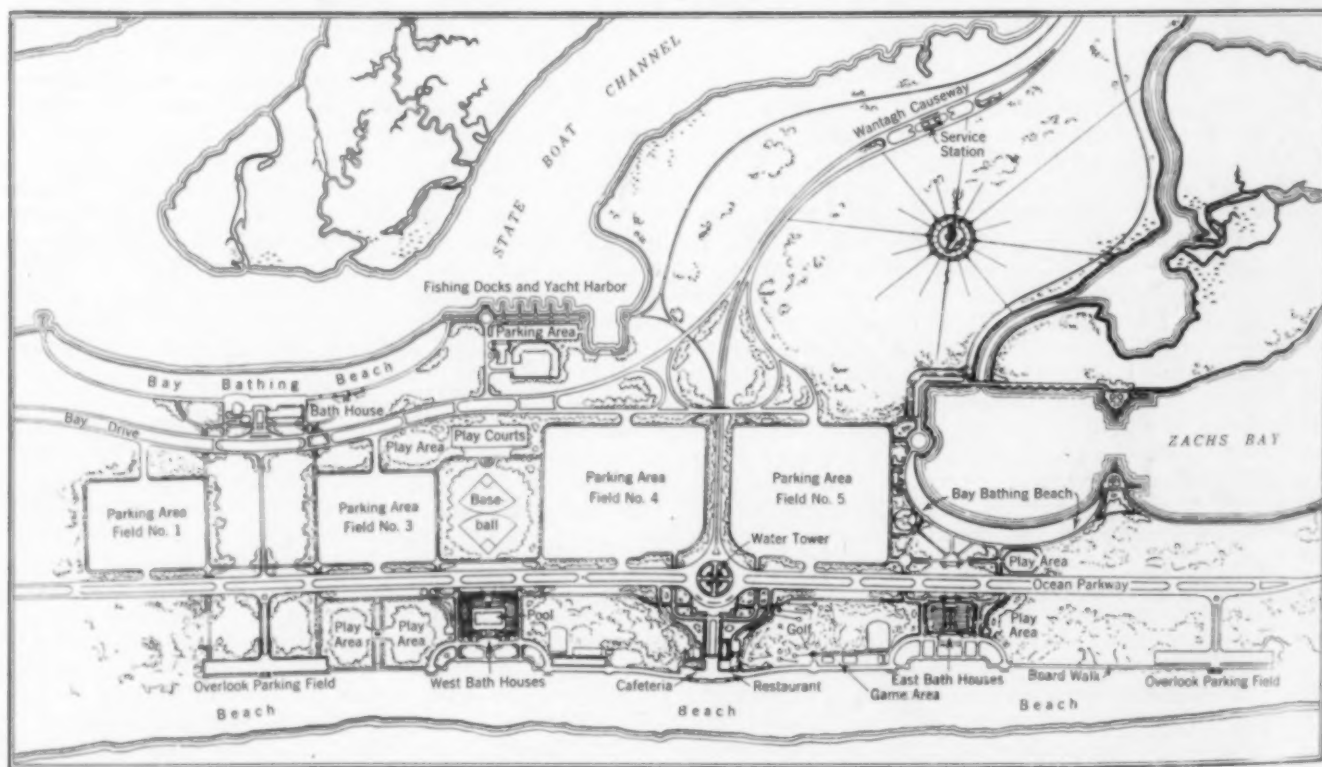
GENERAL PLAN OF JONES BEACH STATE PARK
